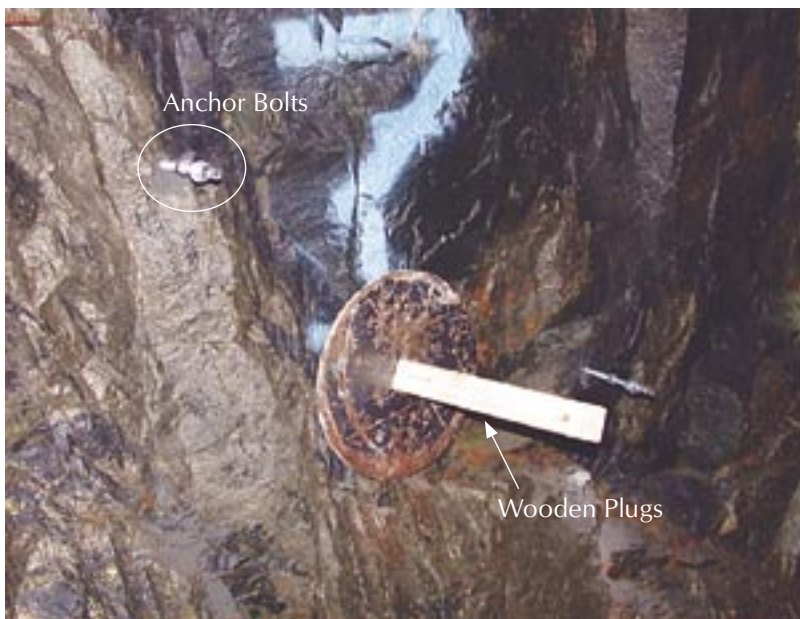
Test site—Layout of steel plates prior to shotcrete operation.
